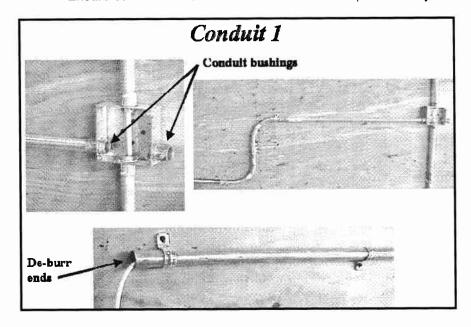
Typical Conduit Installations with Small Pull-Box
